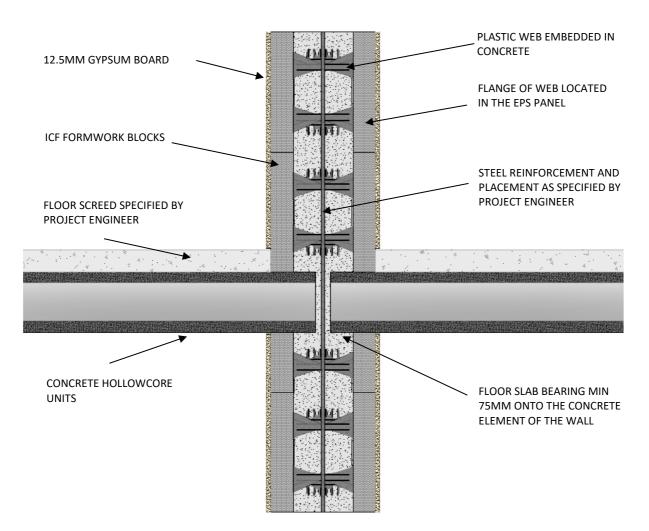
Precast Hollowcore Floor on Interior Compartment Wall
